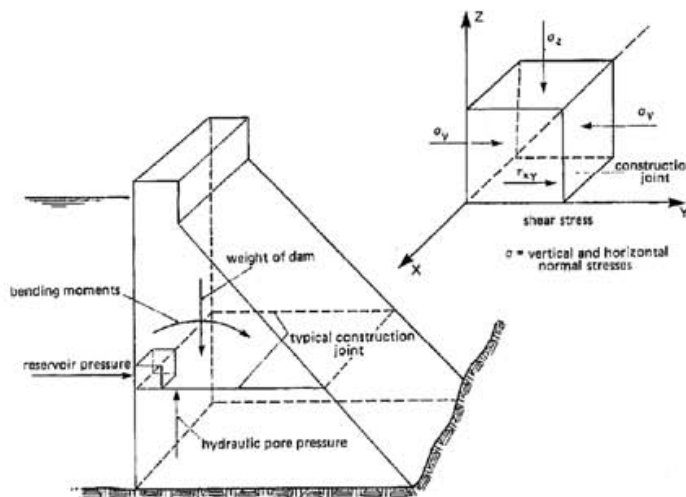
Stresses in and loads on typical construction joints [7.46].
